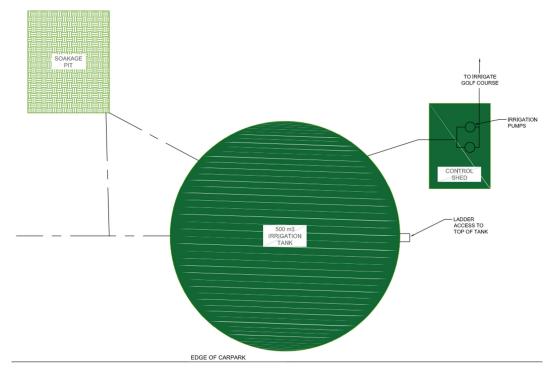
Conceptual layout of the storage tanks and pump shed at Location D.
